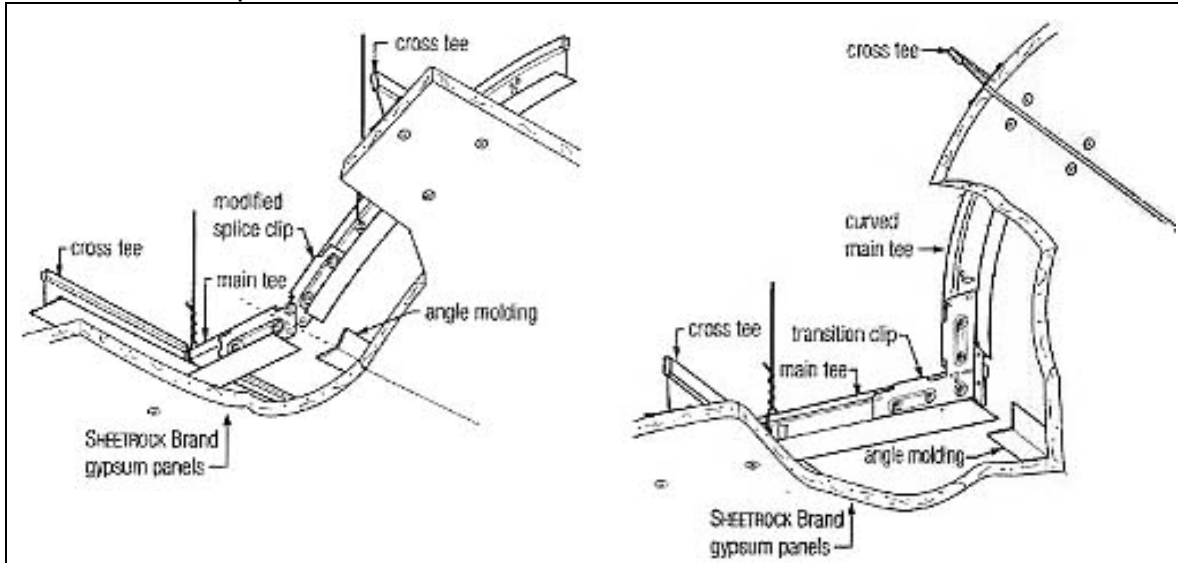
Section and view of acoustical panels dropped ceiling details
